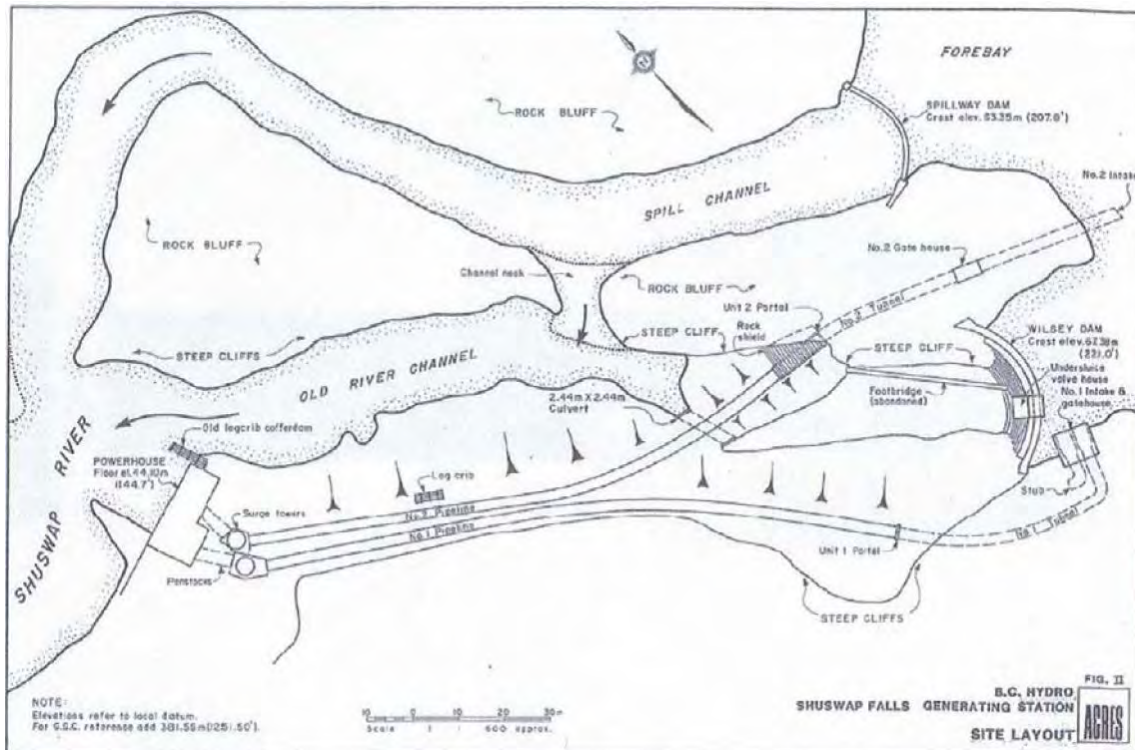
Plan View of Wilsey Dam and Powerhouse (WDFSC 2005)
